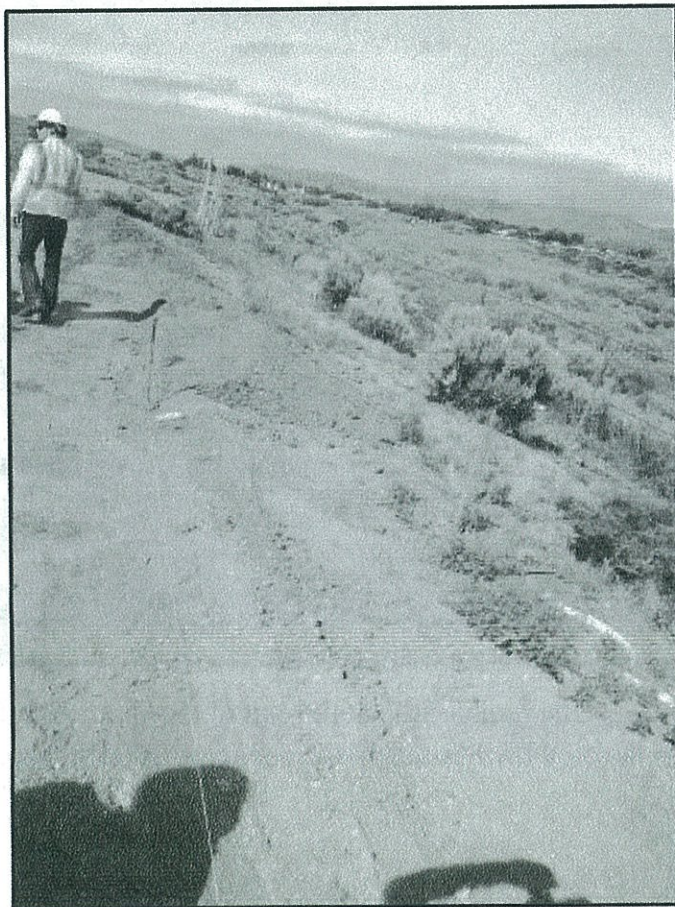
Down-slope of construction site project, Washoe County. The inspector, Harold, indicated that the drainage below the site drains to a terminal basin and does not reach Waters of the US. The SWPPP for this site was a one-page map indicating rumble strips as the only BMP in place.
